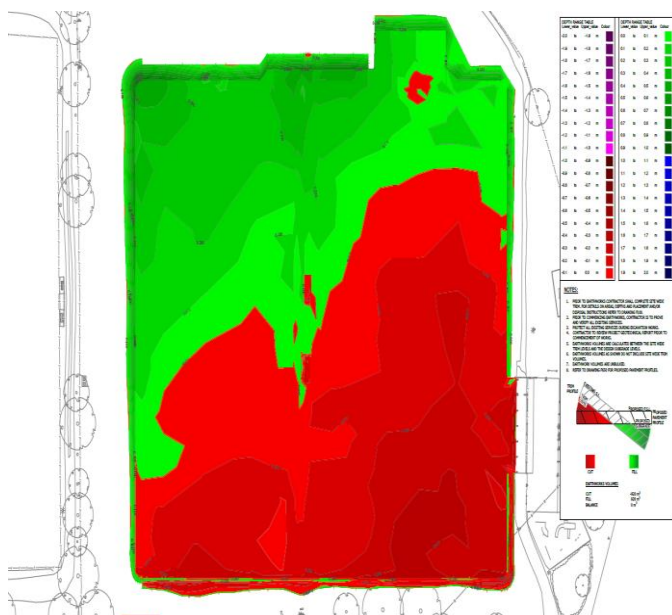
; Typical example of cut and fill modelling from a 3D site survey (Source: SportEng)
